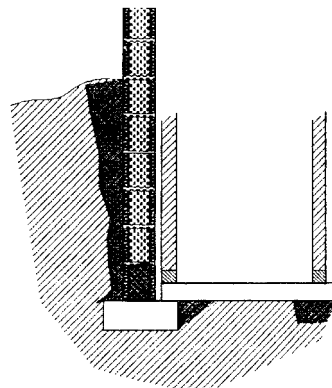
Completed treatment of basement construction (dark shading indicates areas treated).
